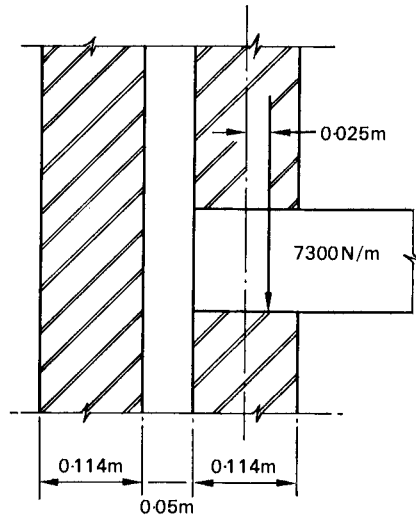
Cavity wall with eccentric loading on the inner leaf.
